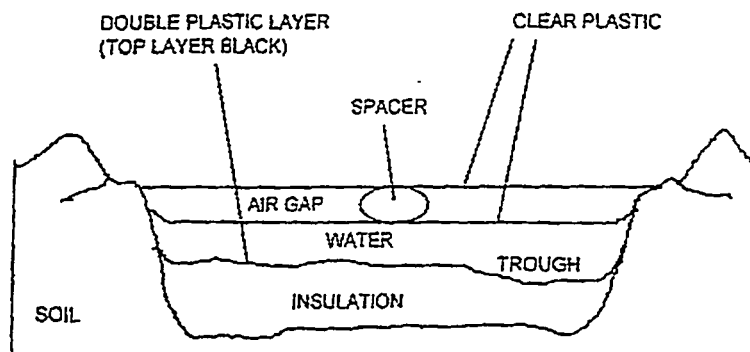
A basic solar puddle shown with horizontal dimensions compressed for clarity.
